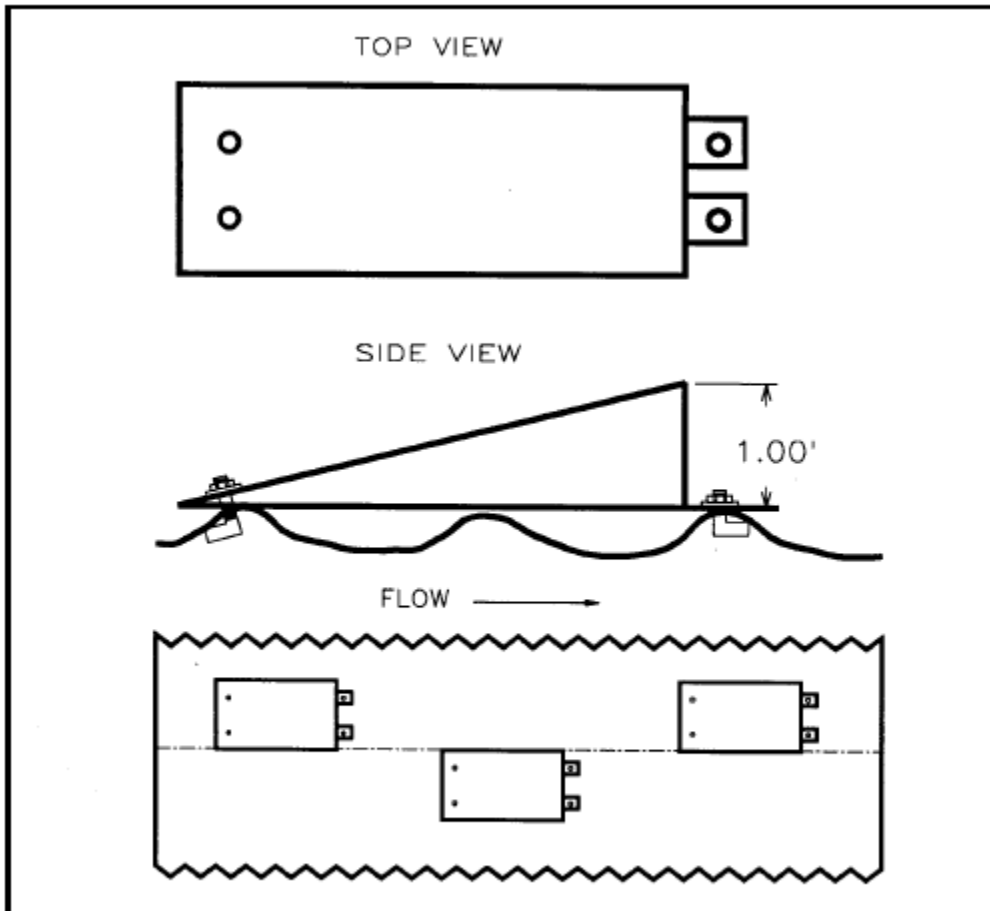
Corrugated metal pipe steel ramp baffles.
